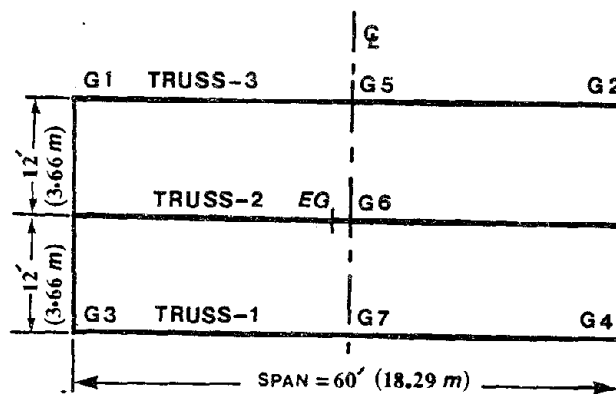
Three-Truss Roof System Showing Location of Gauges.
